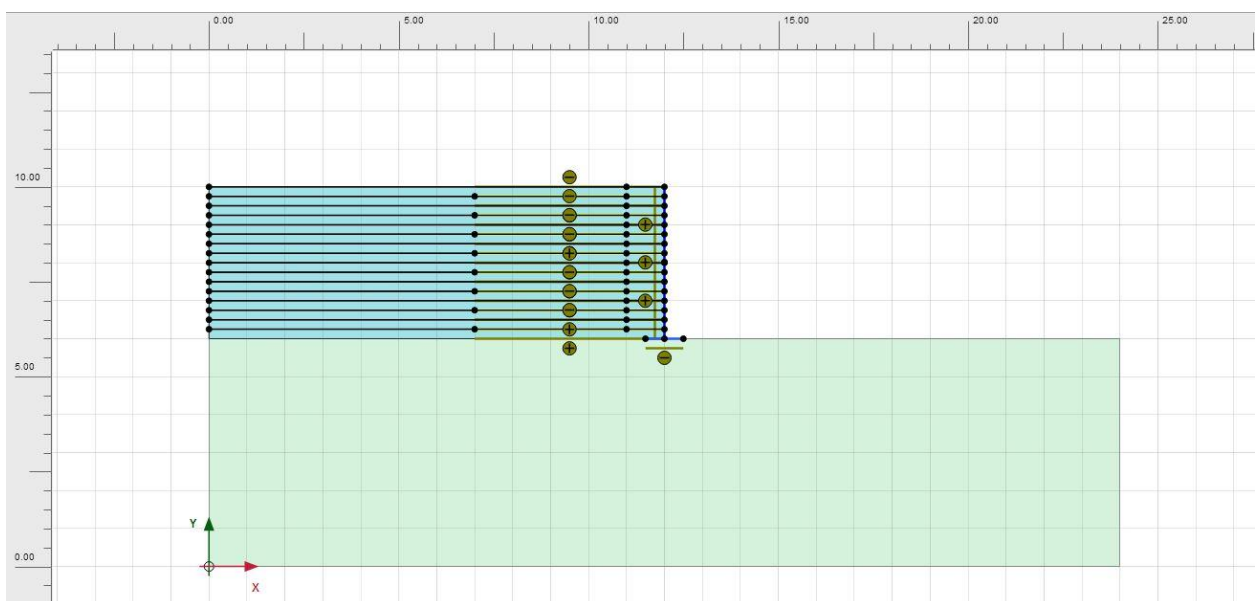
Geometry of retaining wall with geotextile reinforcement
